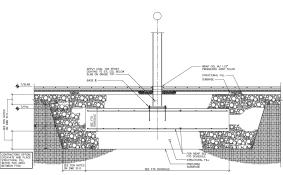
| Section of Typical Interior Footing | 4/S3.02
